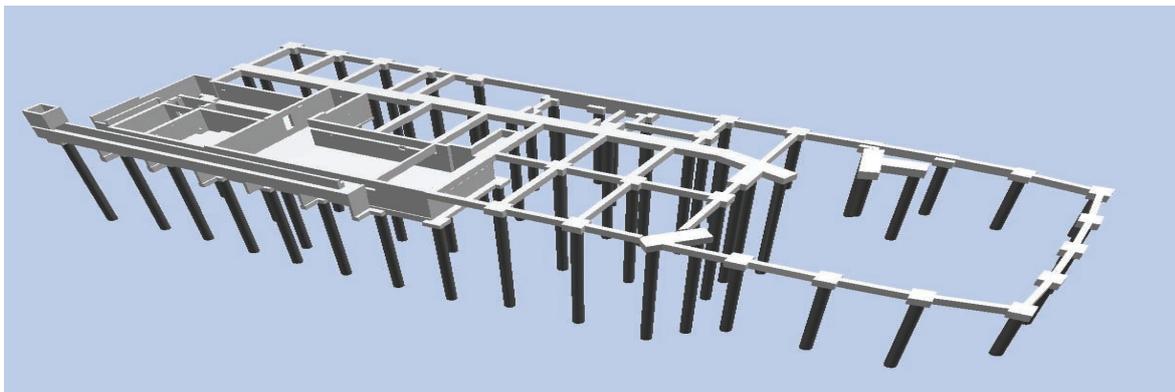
Piled foundation and parts below ground (Rendering: convex ZT GmbH)
